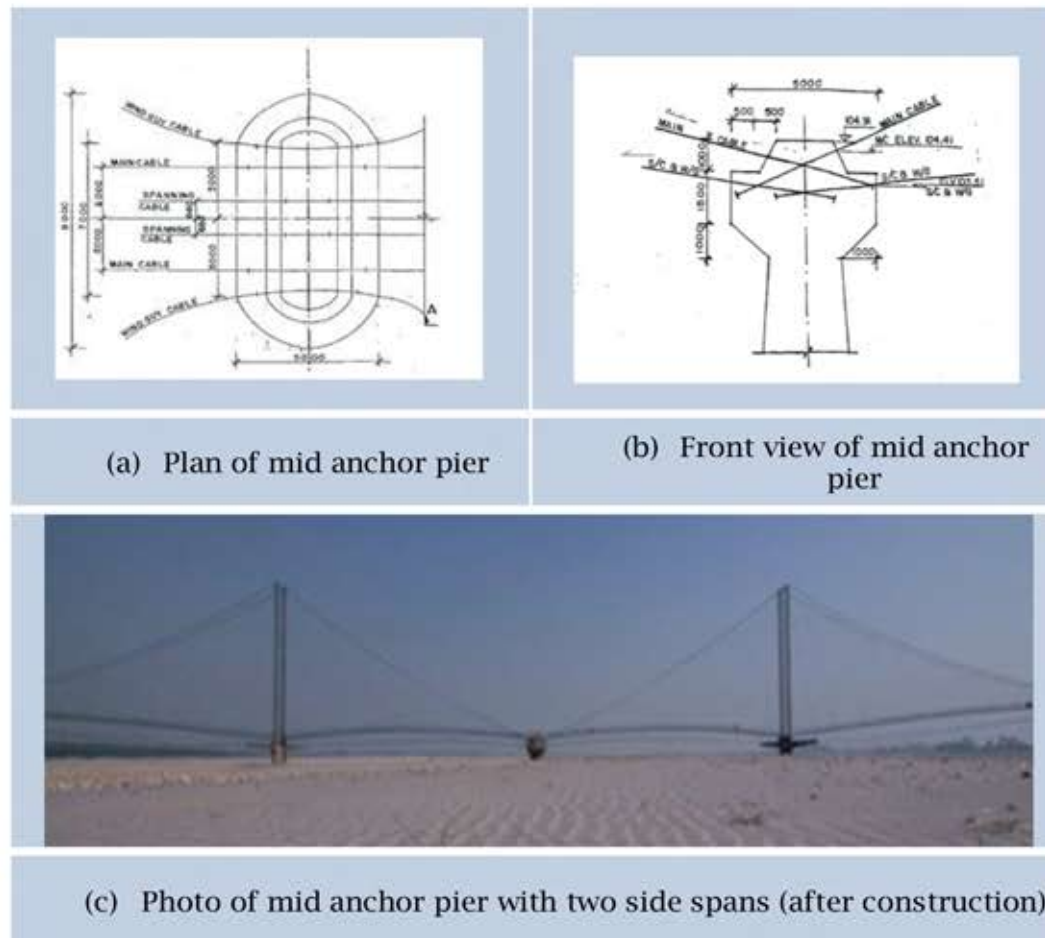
& 10b: Plan and Front Elevation of Anchor pier (Department of Roads, 2000), Figure 10c: Mid anchor pier after construction in 2005 (Arjun Dristi: <https://photographylife.com/photo-spots>)
